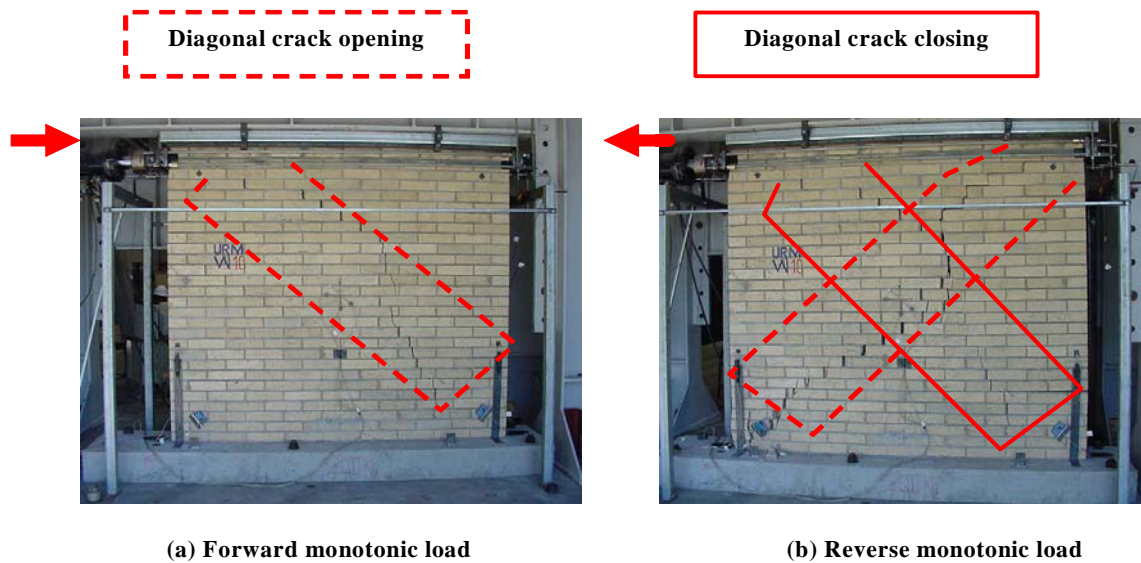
Final crack pattern of URM wall tested under monotonic loading
